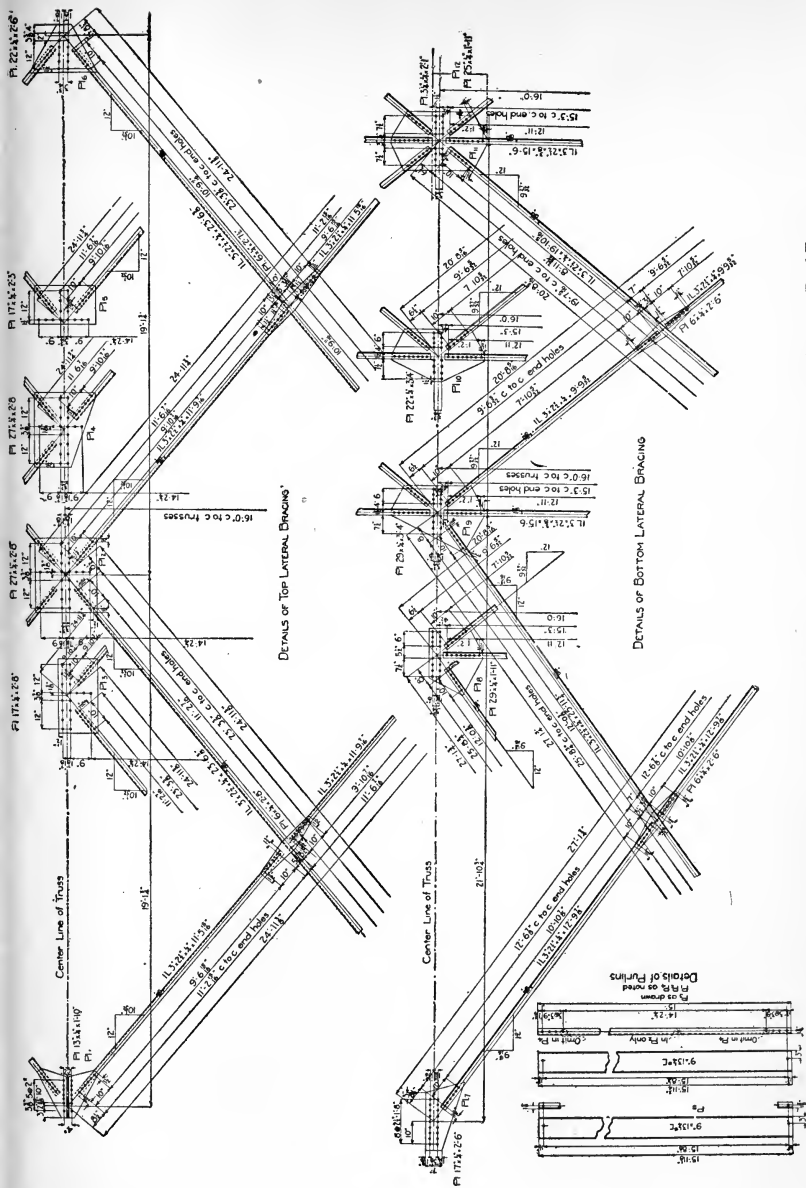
Plate III. Working Shop Drawing Showing Detail of Top and Bottom Lateral Bracing of a Roof Truss.
